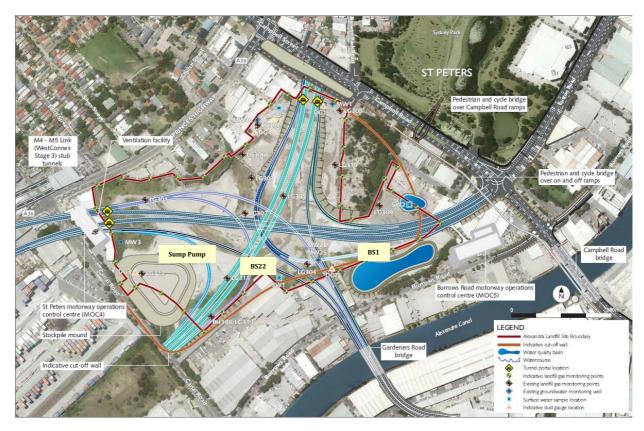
Alexandria Landfill layout and proposed cut-off wall alignment
